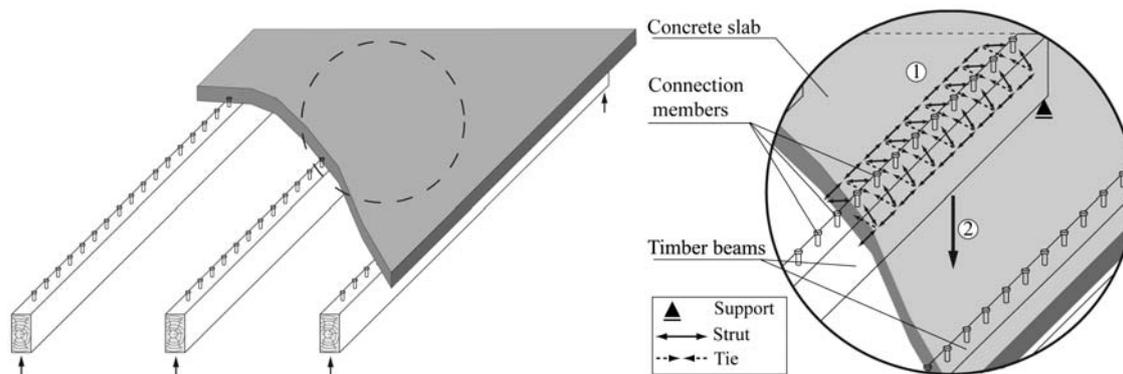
Principle structure of a TCC ceiling (left), loading of the concrete slab (right)
